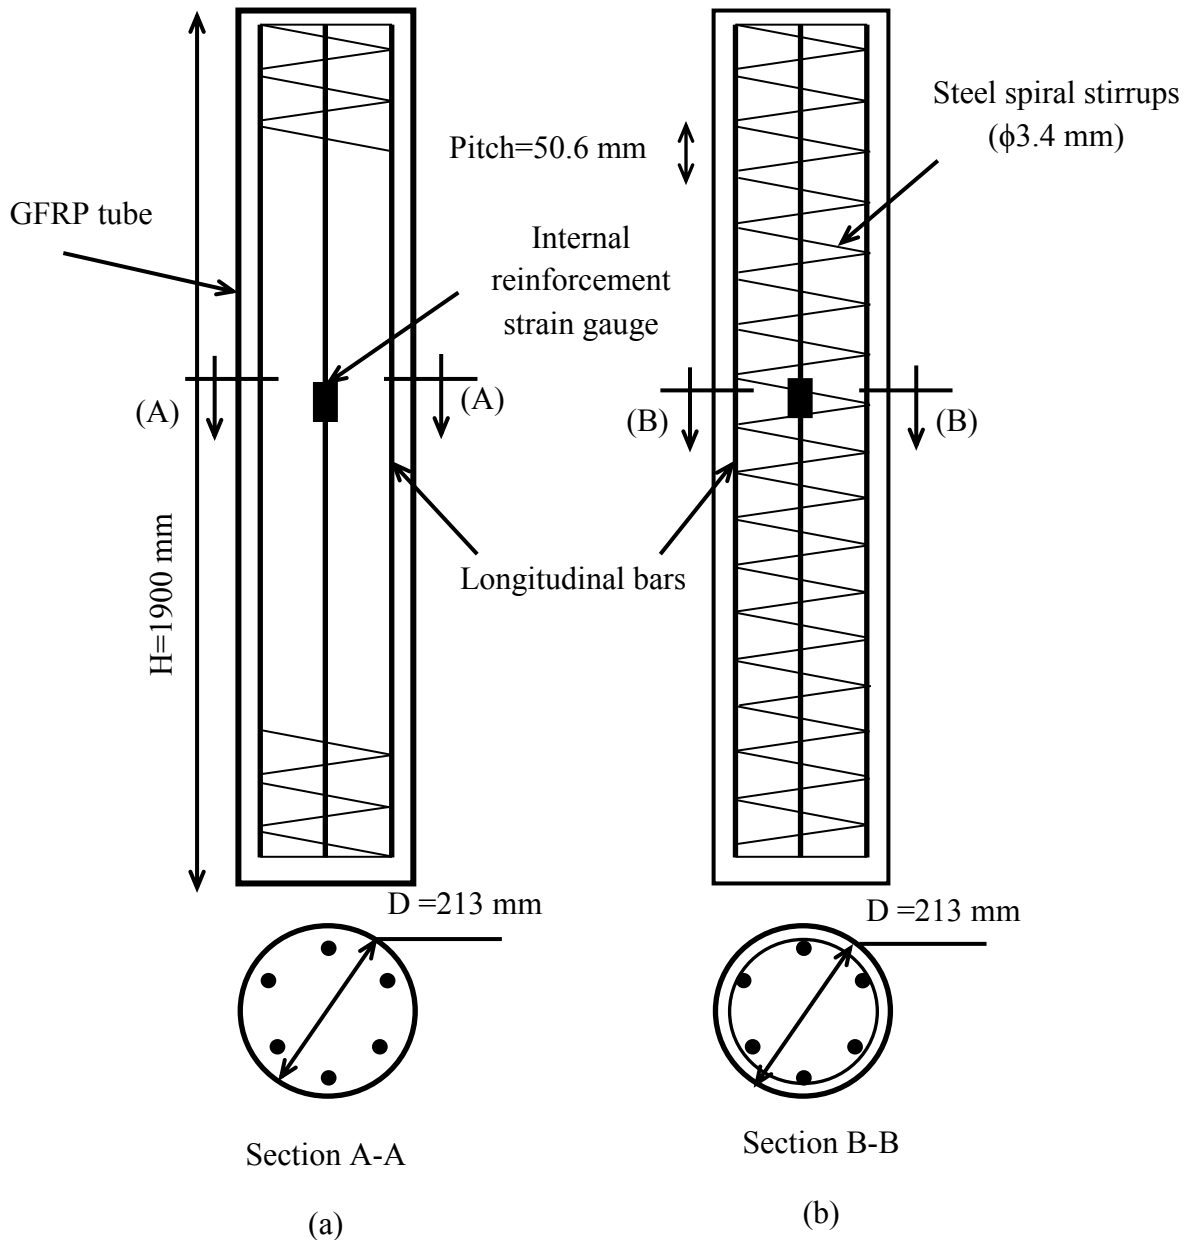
Typical details for the tested specimens and reinforcement layout: (a) CFFT columns; (b) control specimens
